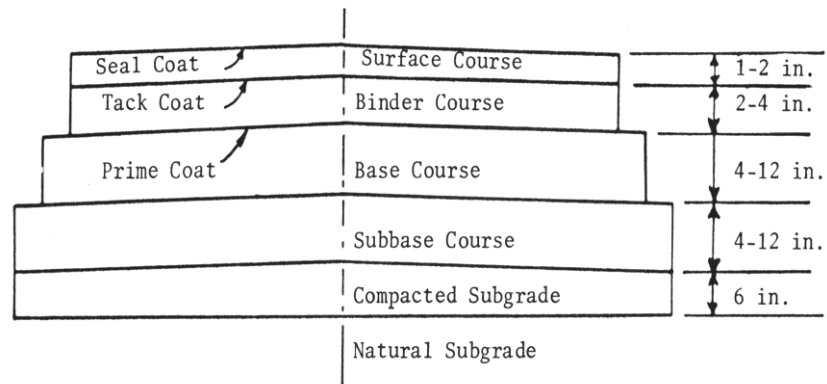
Conventional flexible pavement cross-section (Huang, 2004).
